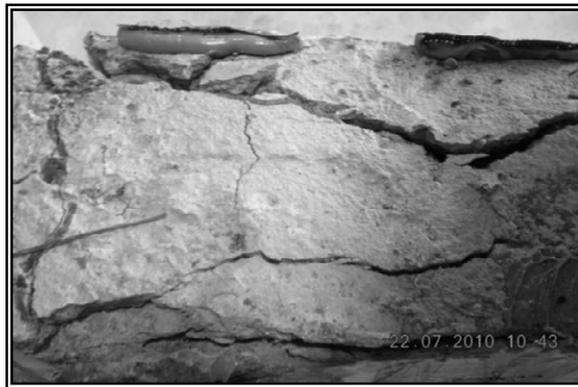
Crushing of concrete (top-side view) of Beam 2-2
